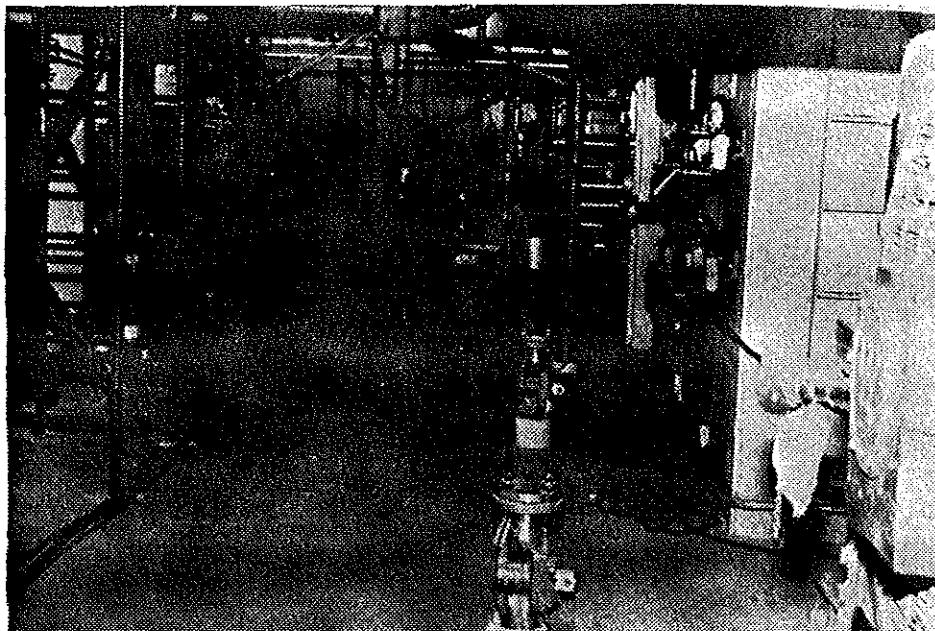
, TEMPORARY WELDING AND POWER CABLES ON THE FLOOR (REF. ALLEGATION NO. 39)
